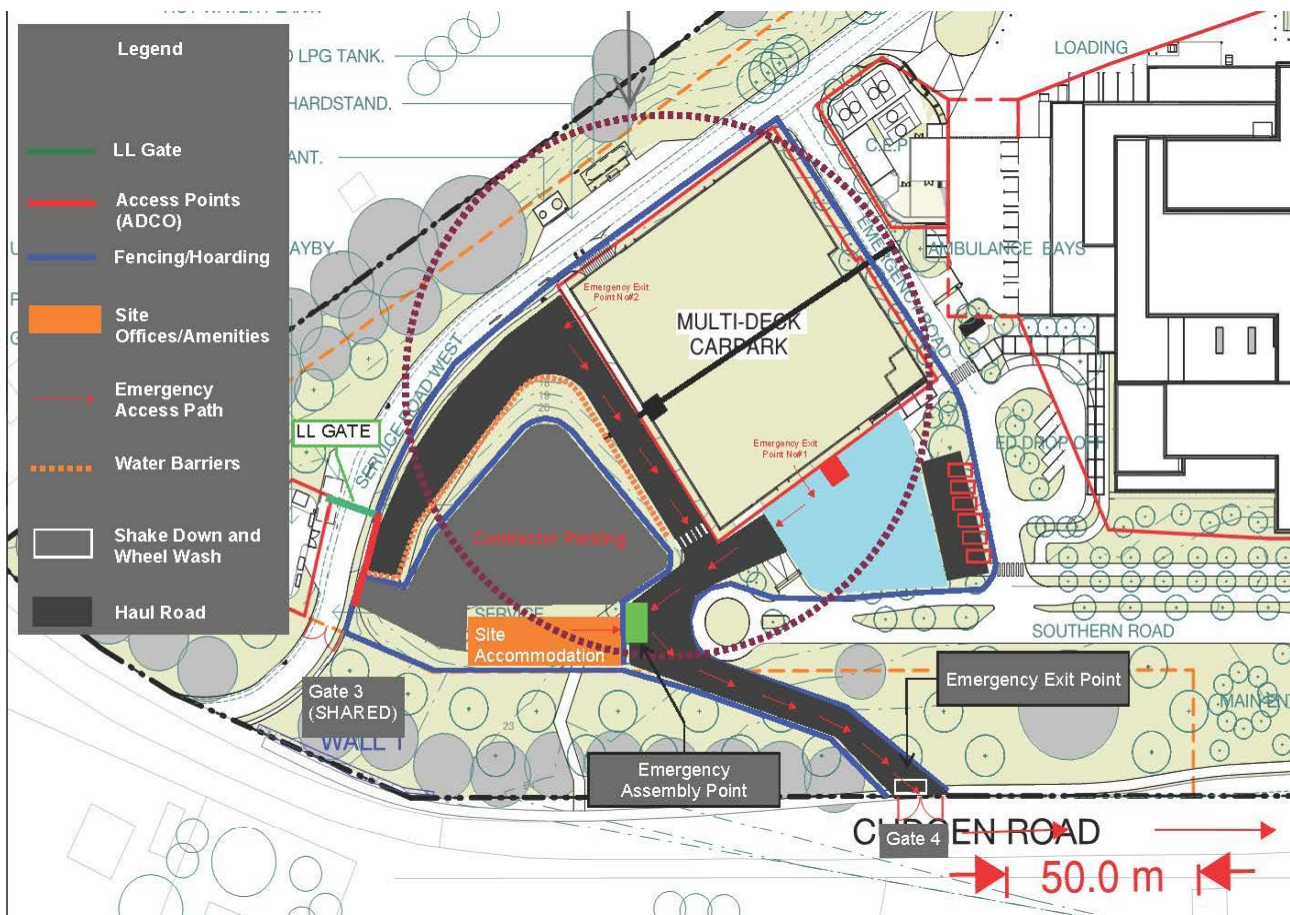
Site Evacuation Plan (courtesy ADCO)
